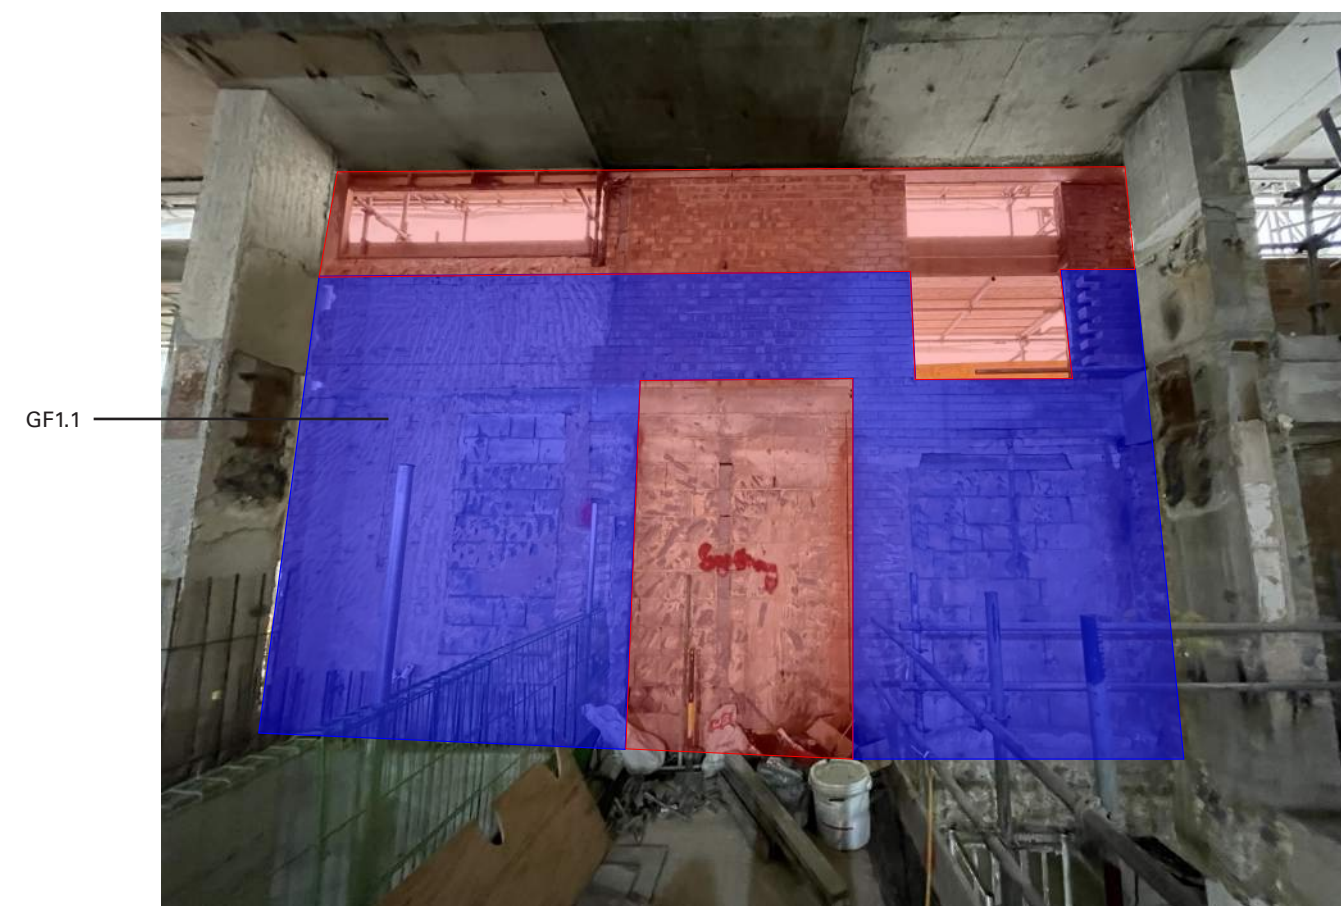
Existing Wall internal View - Proposed additional demolition
